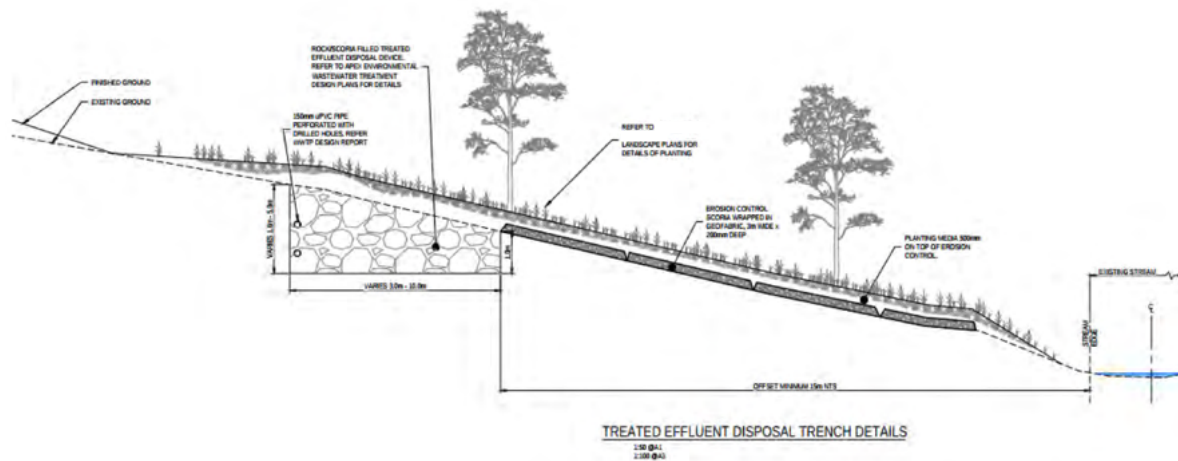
Example of rapid infiltration system for discharge of treated water to surface water via land (cross section only – infiltration trench length to suit design flows and site topography)
